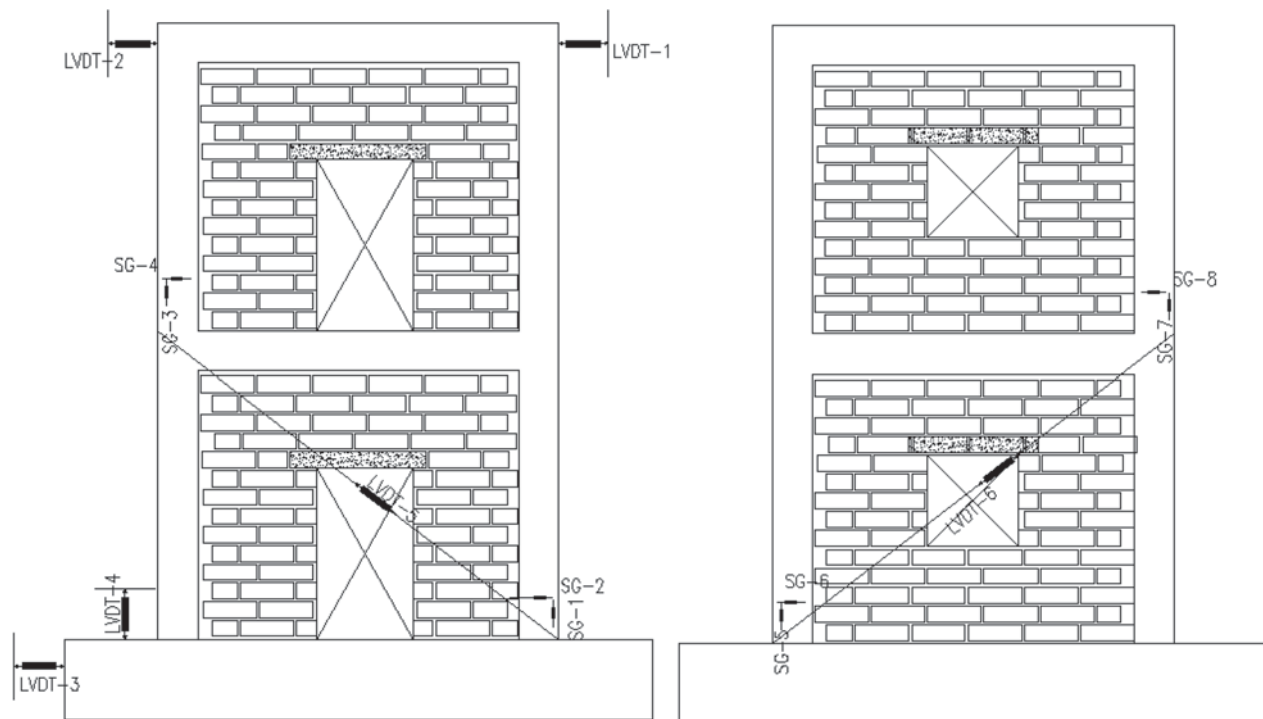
Instrumentation scheme (front elevation/ back elevation)
